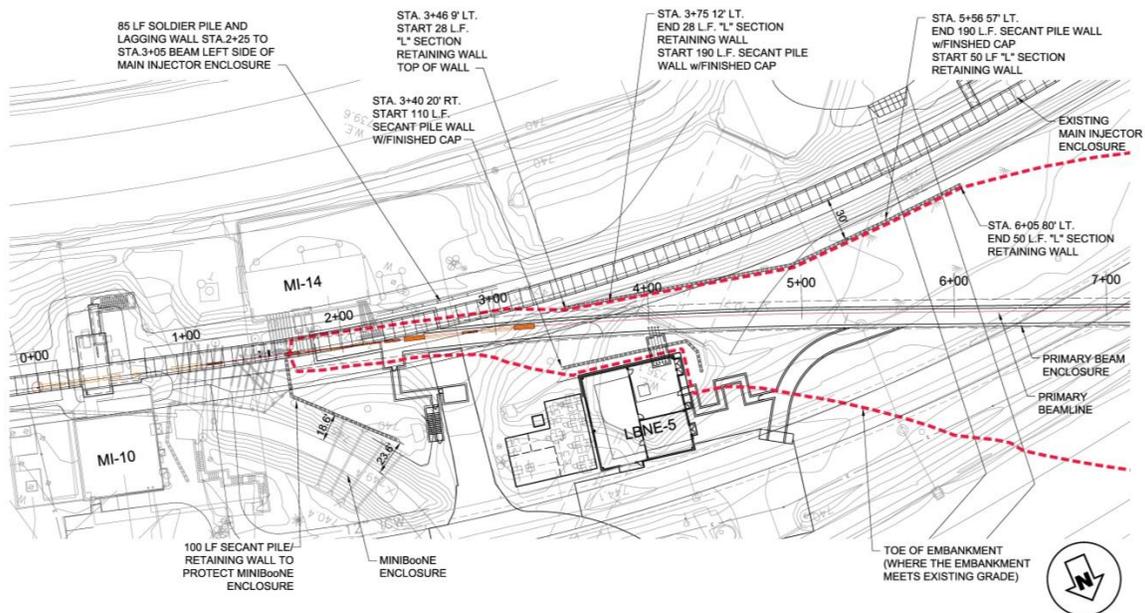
Braced Excavation and Retaining Wall Systems with red dashed line showing the toe of the embankment.
